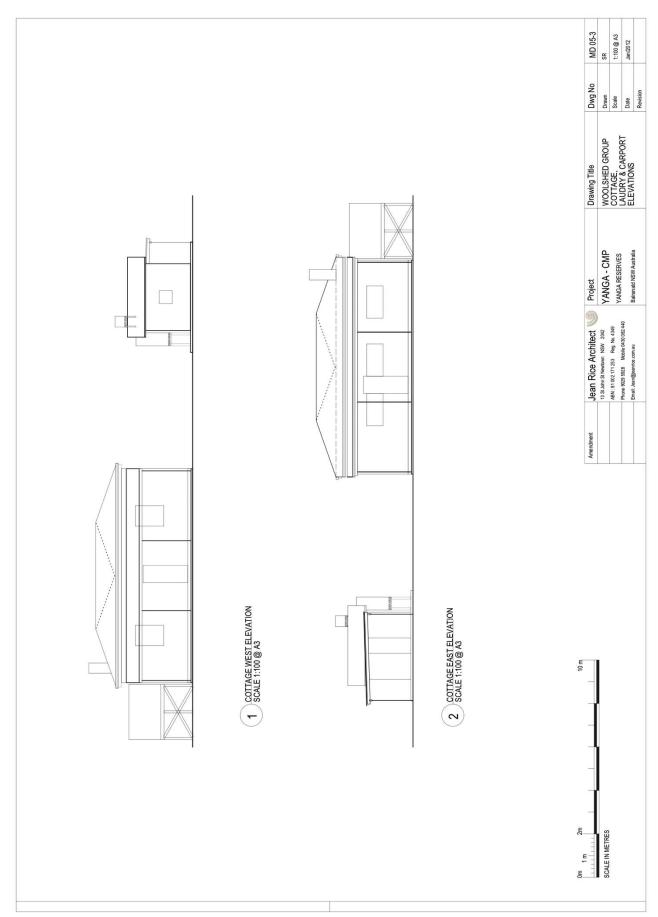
Woolshed Group Woolshed Cottage elevations. Jean Rice Architect, site assessment 2009.
